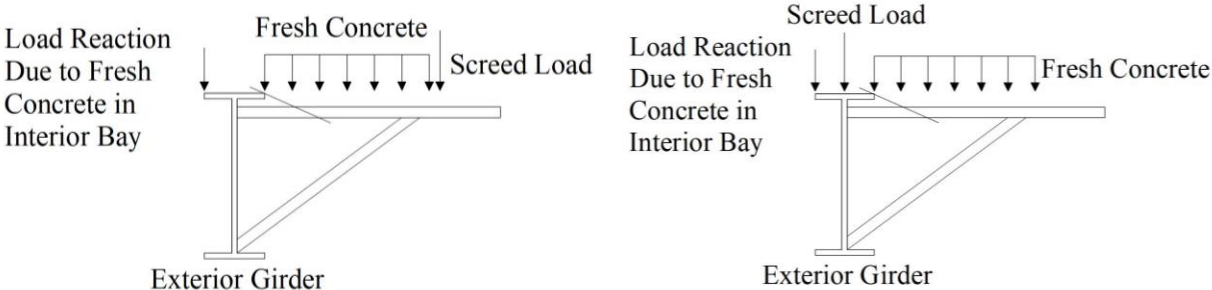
Screed-machine rail located at the center of exterior girder.
